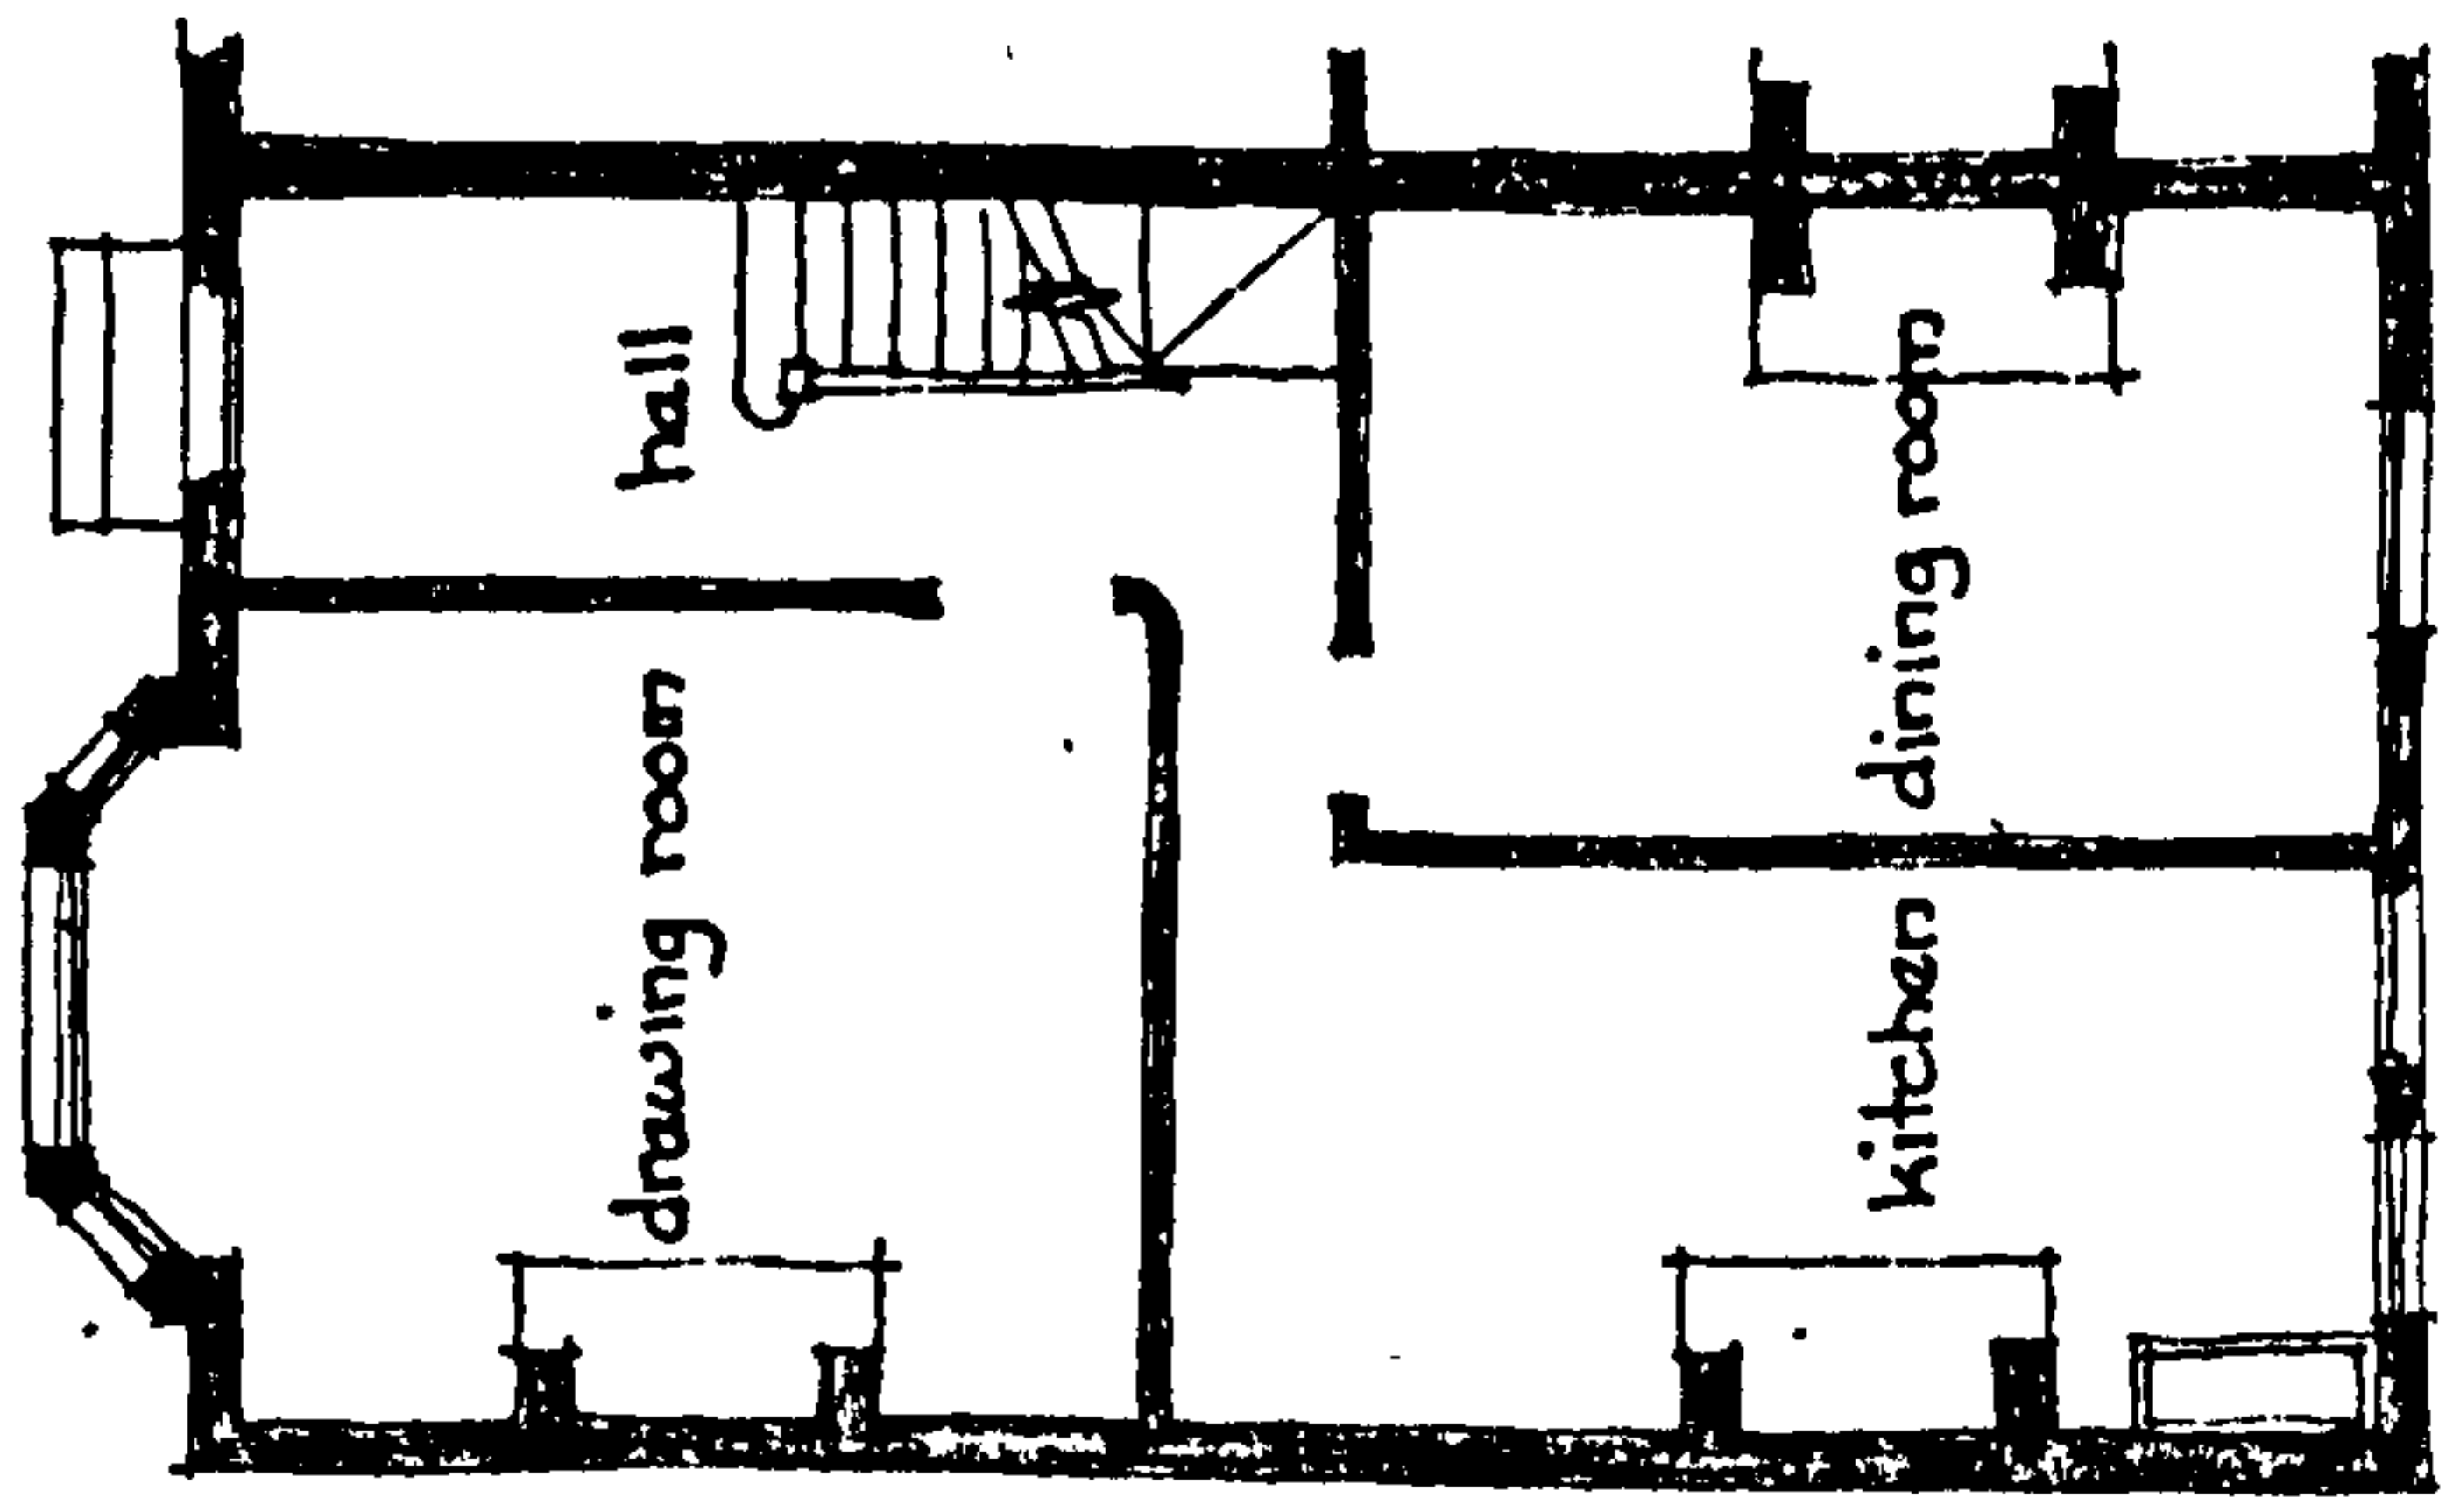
Floor plans of a typical medium-sized dwelling erected in the study area (J. Owston 1889).
